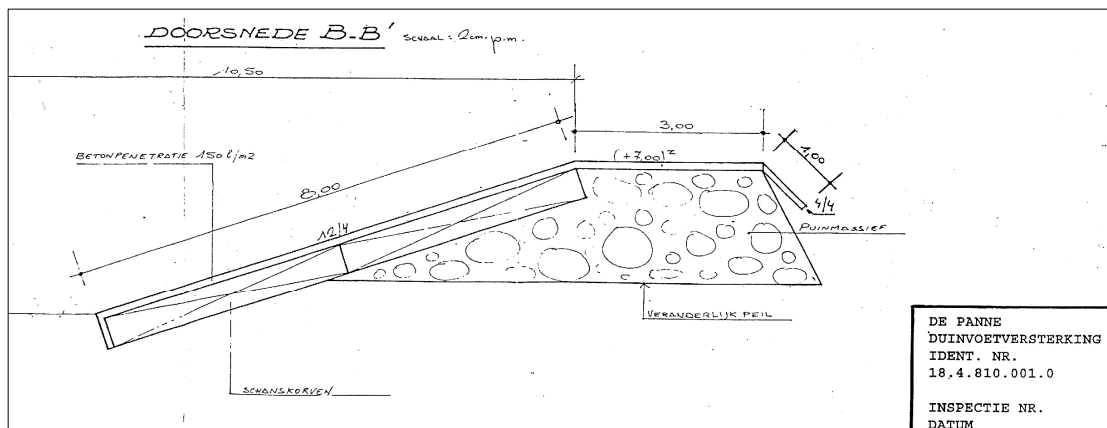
Construction design of dune foot strengthening off De Panne (Afdeling Kust)
